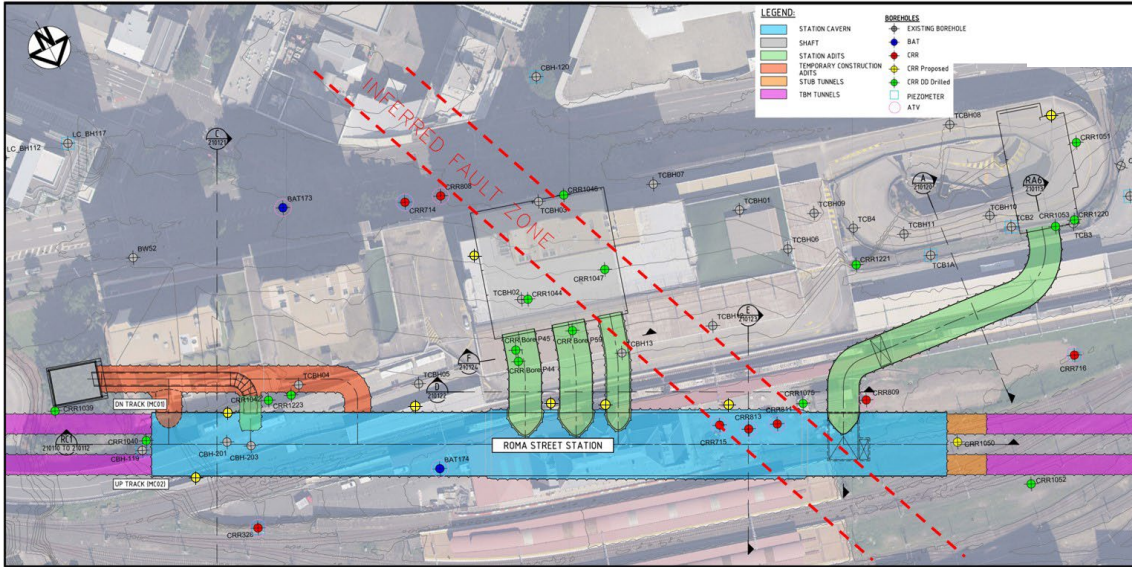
Roma Street Station borehole plan, showing inferred fault zone.
